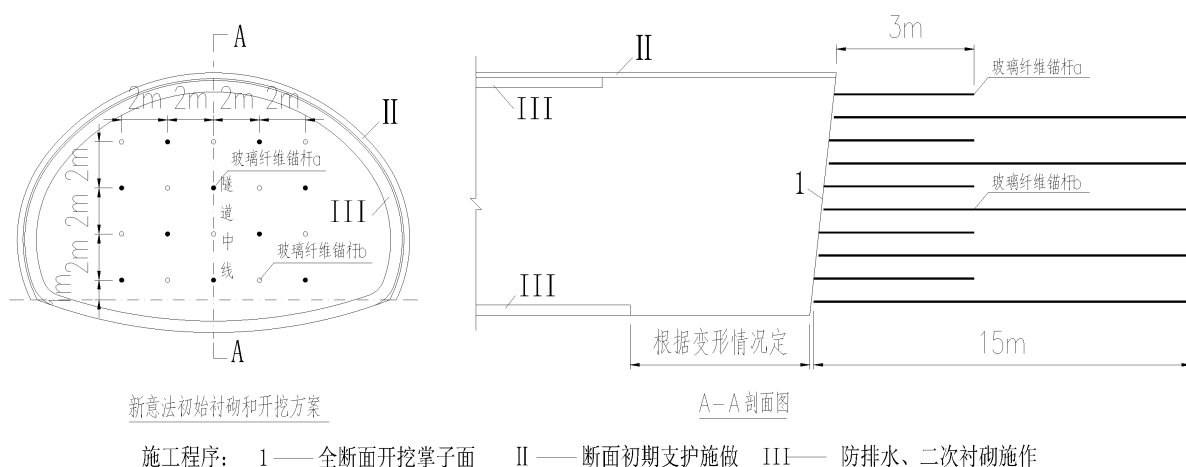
Full face excavation by NITM and core-face stabilization using fiber-glass bolts
